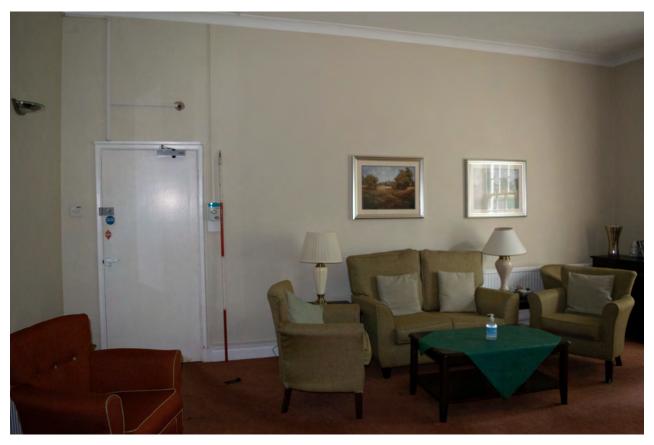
South facing wall of lounge showing exist into hallway 1. 2m scale.
